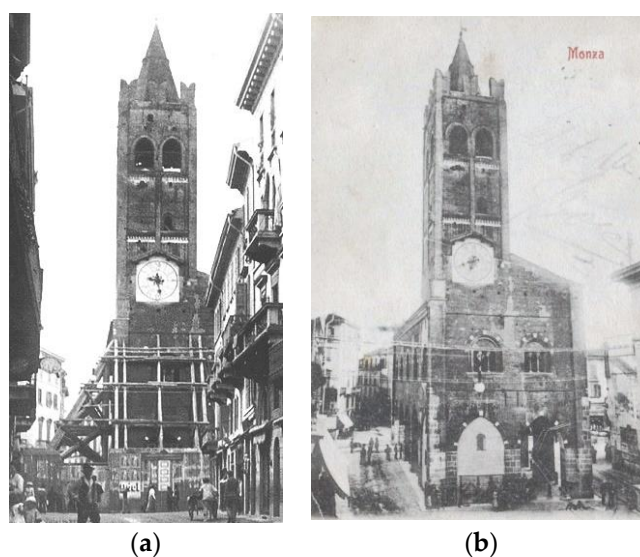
In 1881, serious damages to the north and east sides raised concerns and a temporary structure was built (a); a wide repair intervention was carried out to repair the damaged walls (b).
